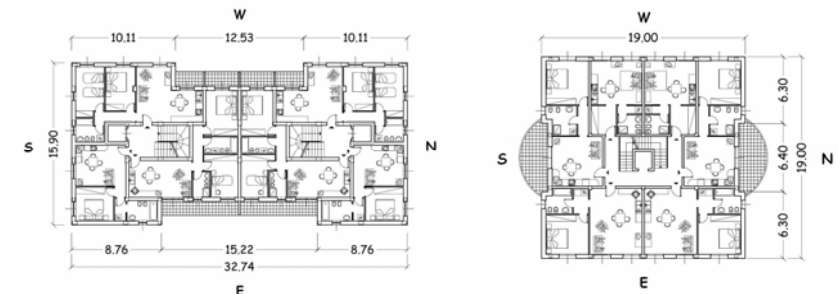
Buildings’ plants: line (sx) and tower (dx)
